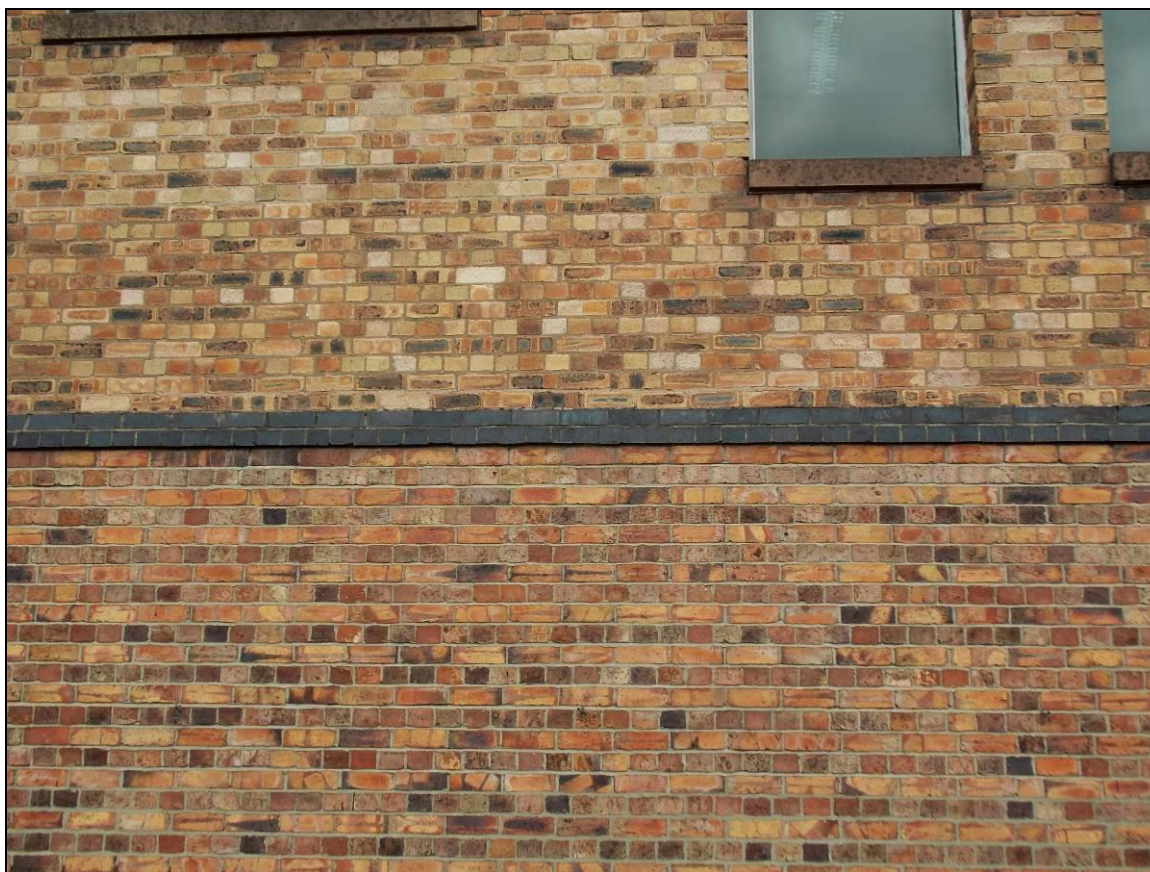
Different type of brickwork between the ground and first floors, looking north.
